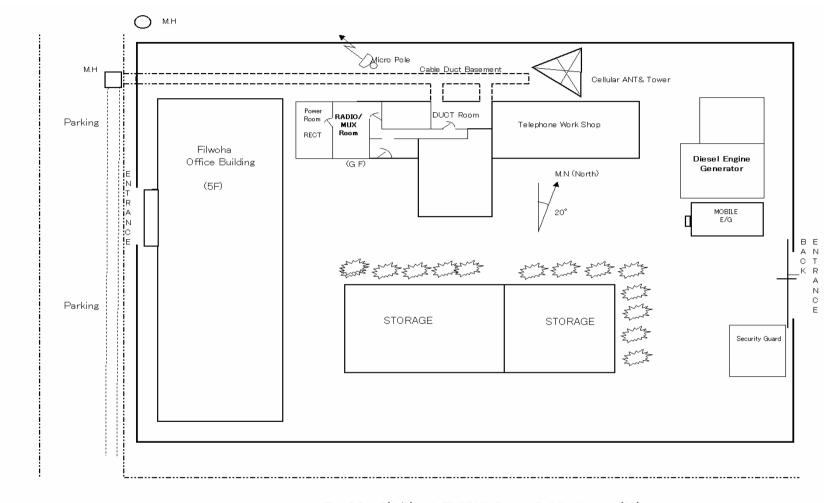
(1/2) AA FILWOHA Center Building Layout (1F)
